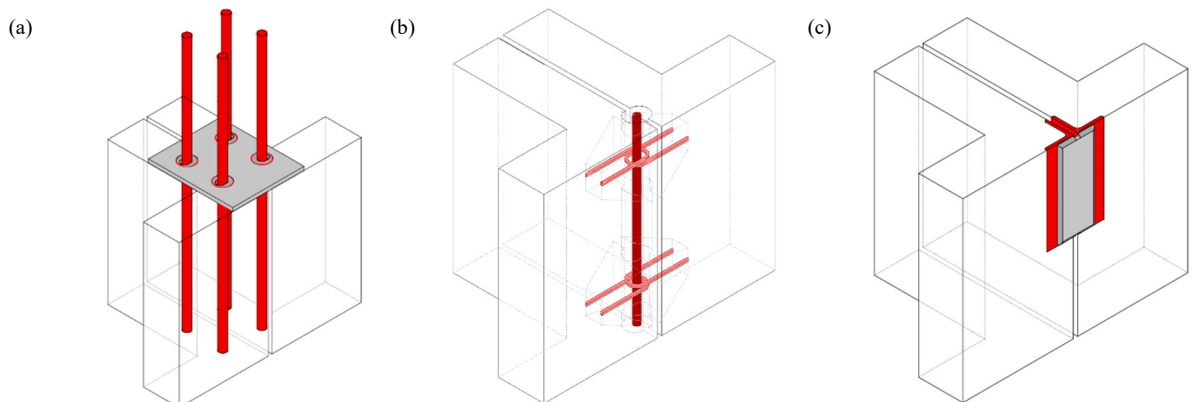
Conceptual sketch of the horizontal connection system: (a) dowelled plate; (b) diamond-loop mortar joint; (c) welded plate.
